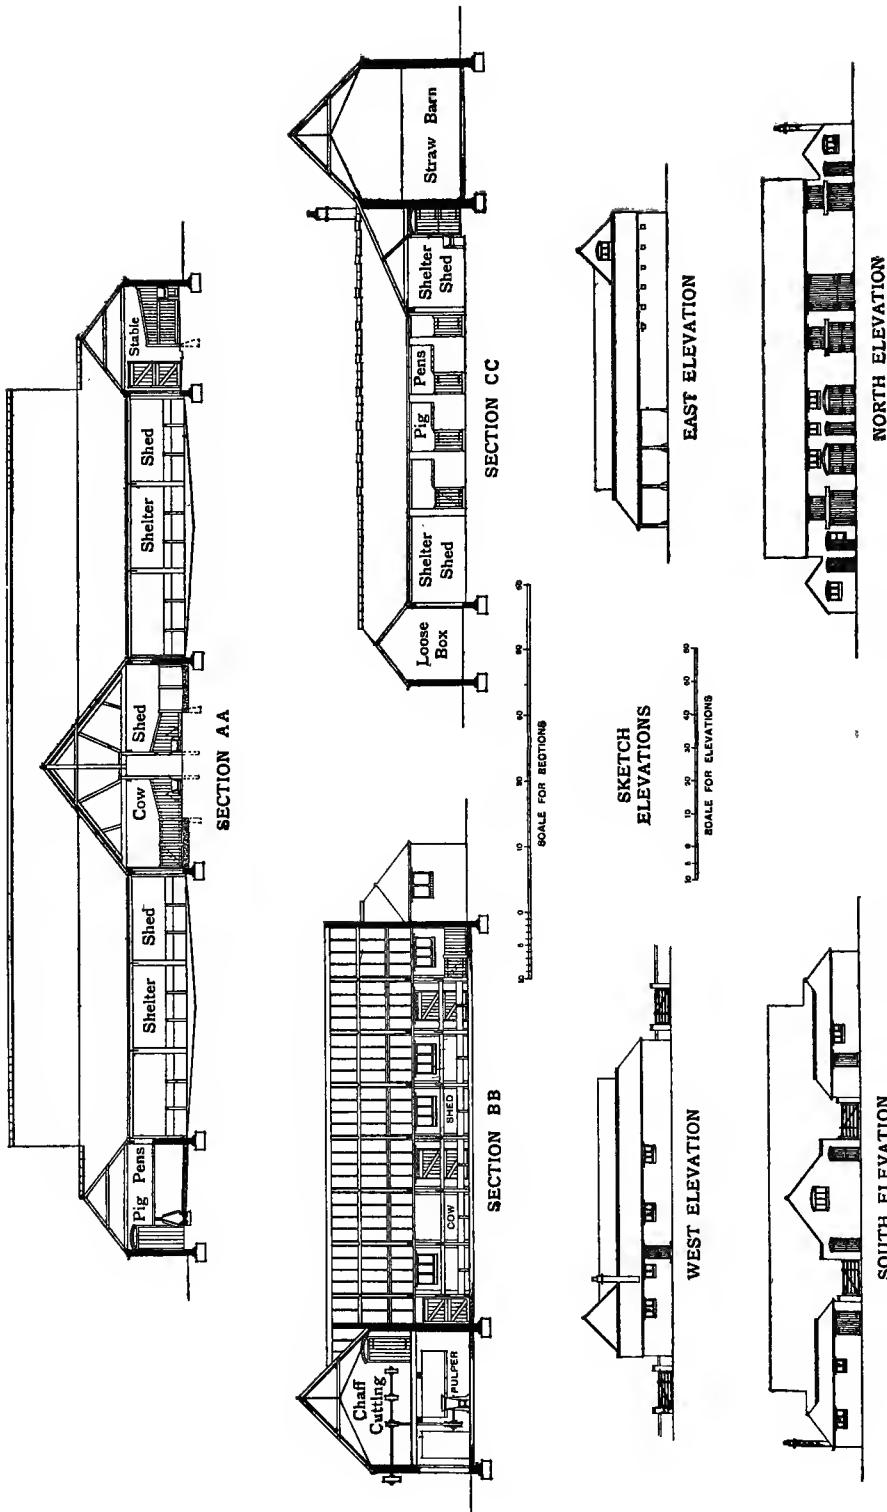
Front and Sectional Elevations of the Buildings shown in fig. 2
